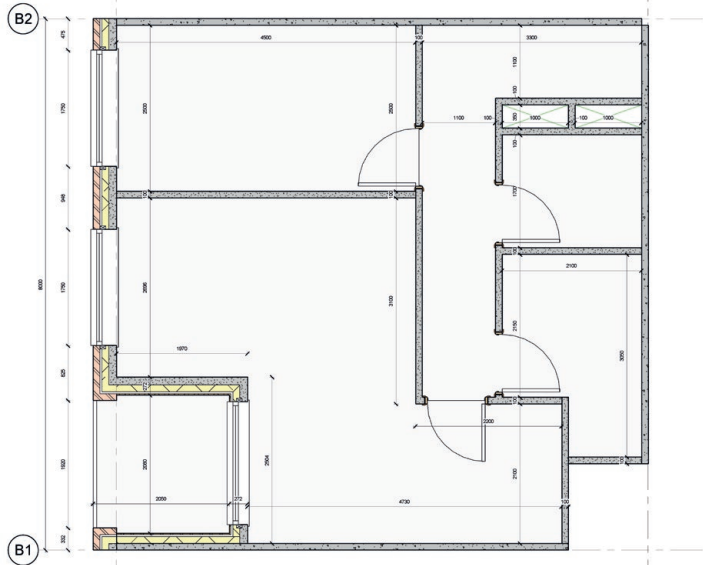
floor plan of the assessed walk-up apartment building, showing two housing types A and C. Dimensions in mm. A larger size of the floor plan is in appendix 4. Own source.
